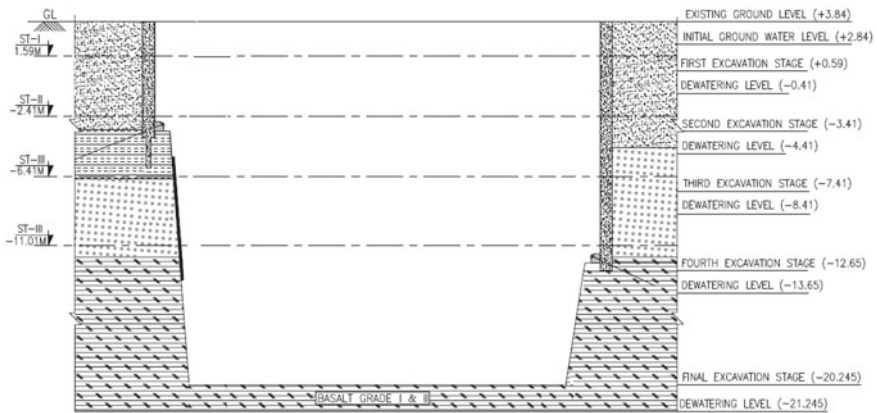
Excavation and Strut Level details of Cuffe Parade station
